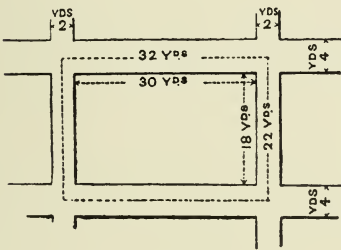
SKETCH OF A PILLAR WITH DIMENSIONS MARKED.
